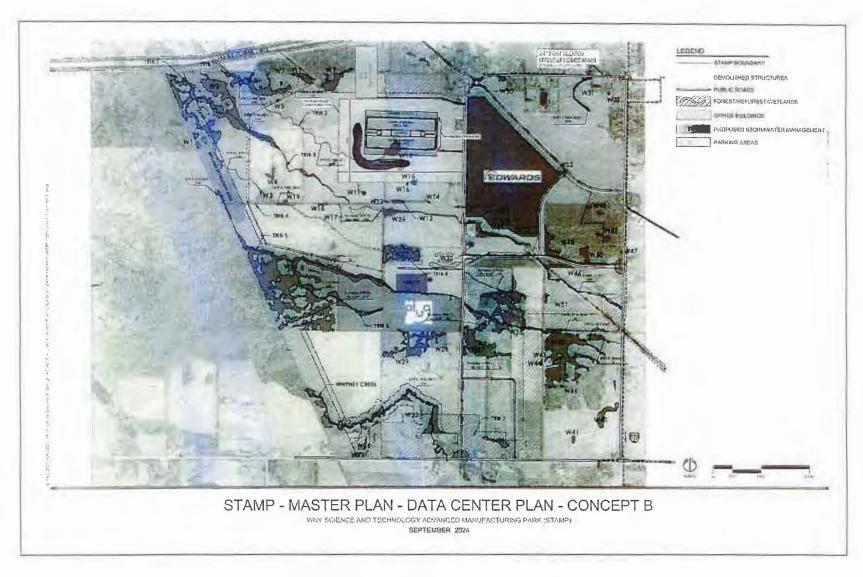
B Data Center Facility Schematic Site Plan - Concept B
